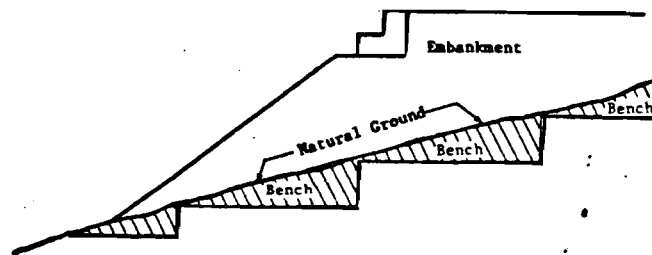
Abutment end section with natural ground benched (from Ref 2).
